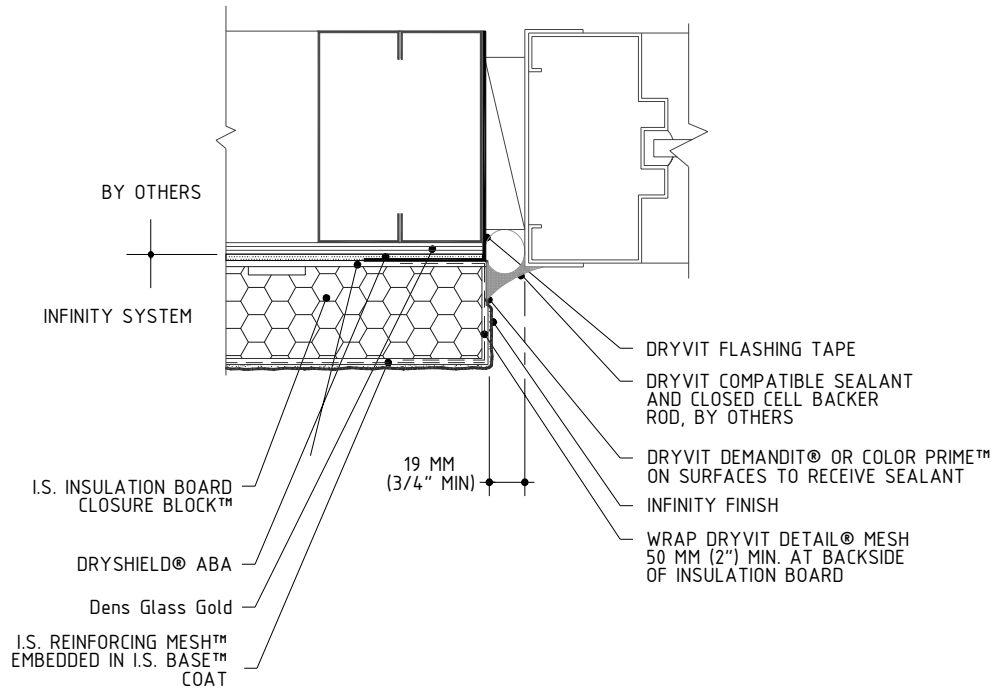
TYPICAL INSTALLATION DETAILS—(Continued)
